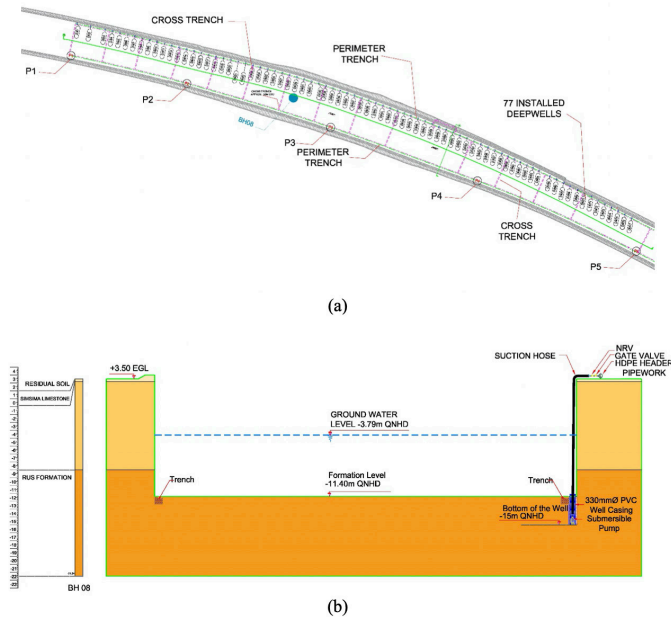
Schematic drawing for the excavation and the employed dewatering system: (a) plan; (b) cross section
